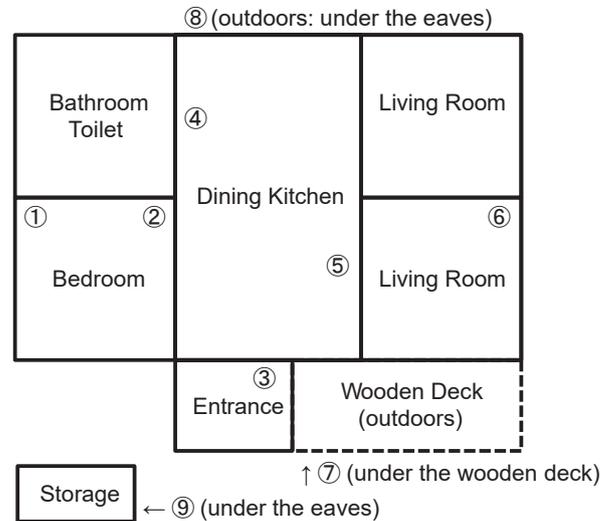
Simplified floor plan of a dwelling, radon measuring Site H (Fig. 2). ① – ⑨ show measuring points where radon monitors were placed.
